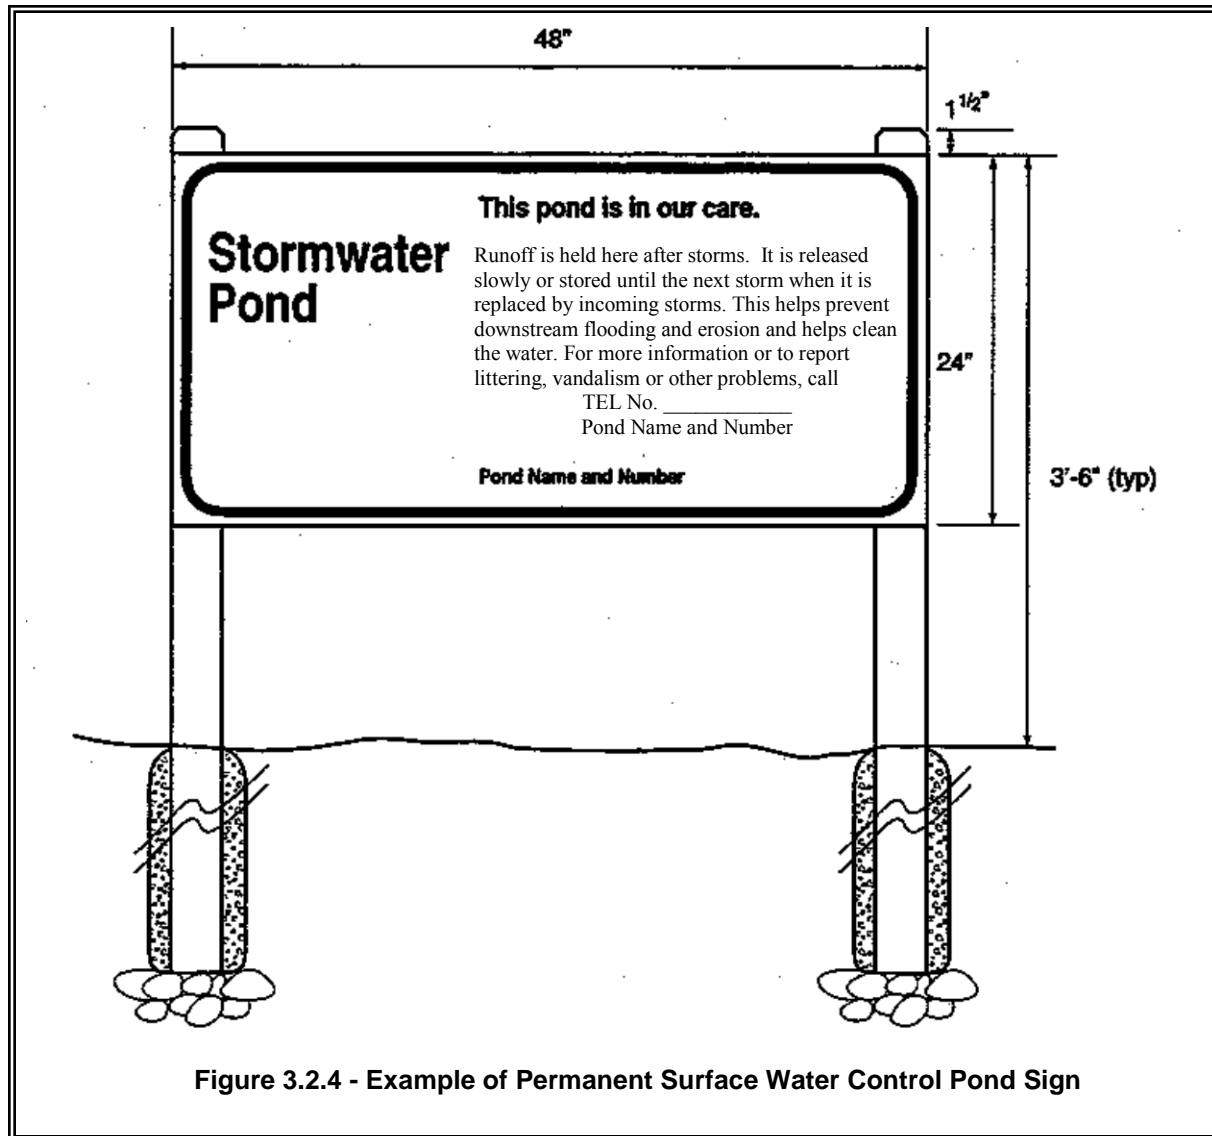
Example of Permanent Surface Water Control Pond Sign
